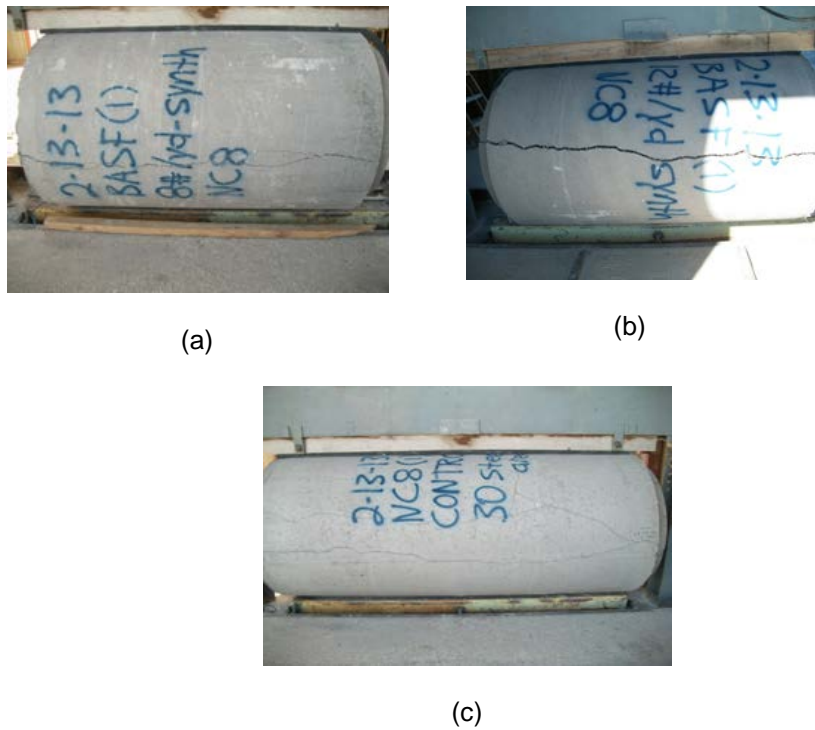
Pipe test set up and crack pattern 36 in.; (a) synthetic fiber reinforced pipe 8 PCY w/o steel cage, (b) synthetic fiber reinforced 12 PCY w/o steel cage, (c) regular reinforced pipe
